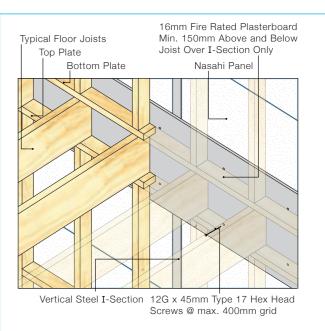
90 Minute FRL Solution - Fire Rated Plasterboard Installation (Floor Joist Zone)
